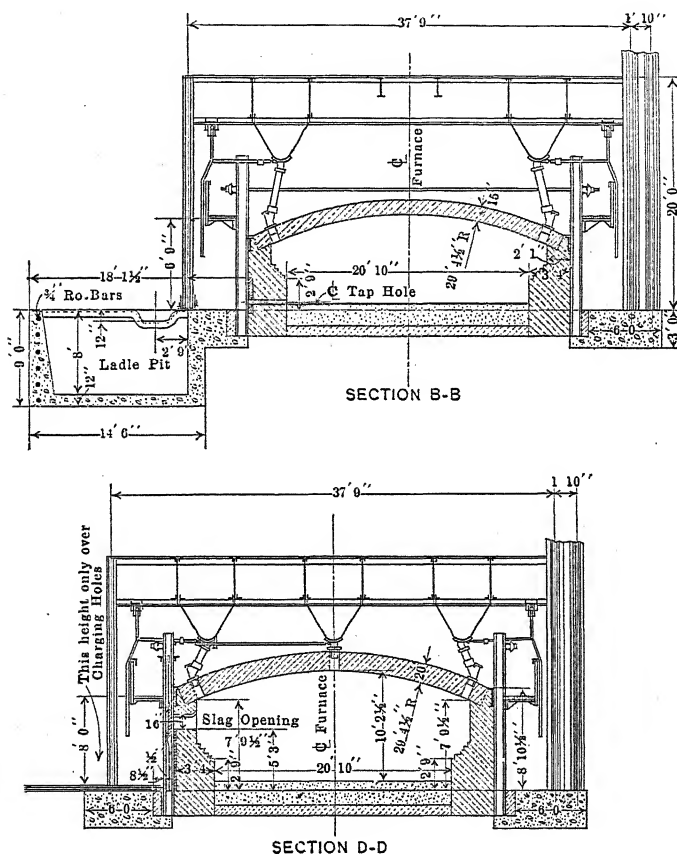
CROSS-SECTIONS THROUGH SLAG FURNACE.
